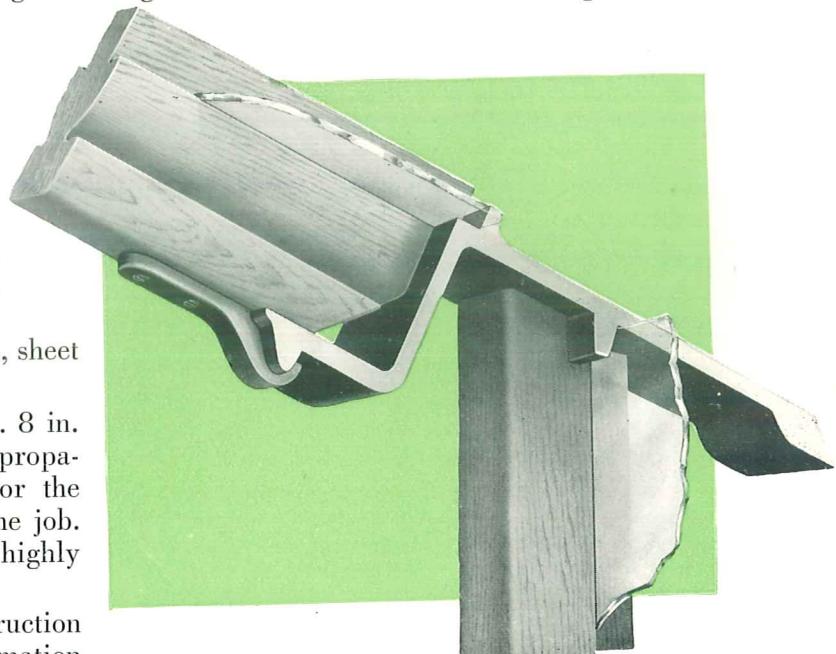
Typical eave assembly in a low-eave type Metropolitan Greenhouse with Metropolitan Patented Cast-iron Eave and Gutter Plate.
